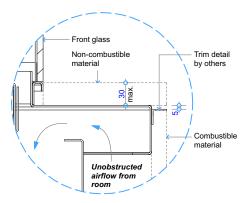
Bottom of Fire to Floor Opt. 5 NOTE: 45,000mm<sup>2</sup> min. or equivalent unobstructed air supply to underside of hearth
